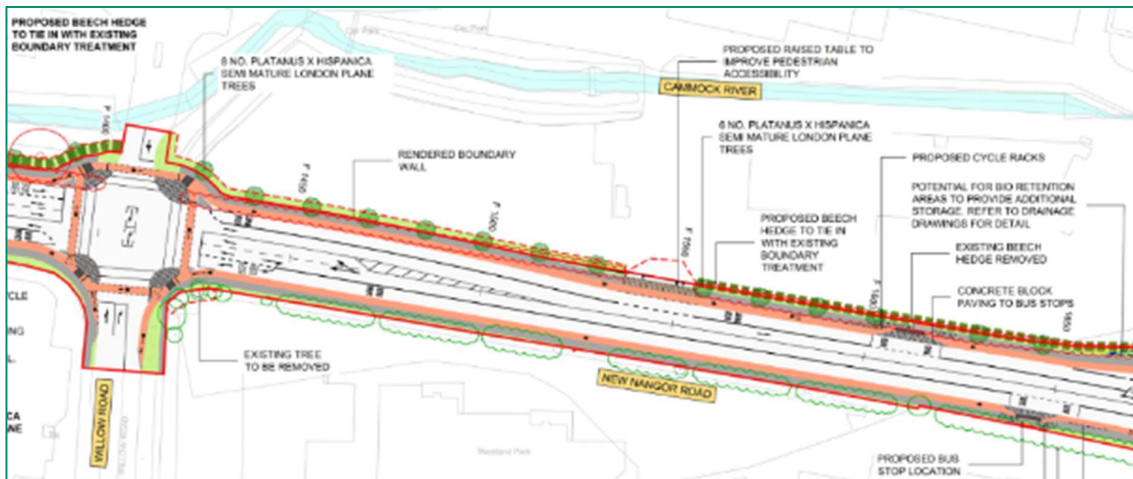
Extract from Landscaping General Arrangement drawings at Toyota site
